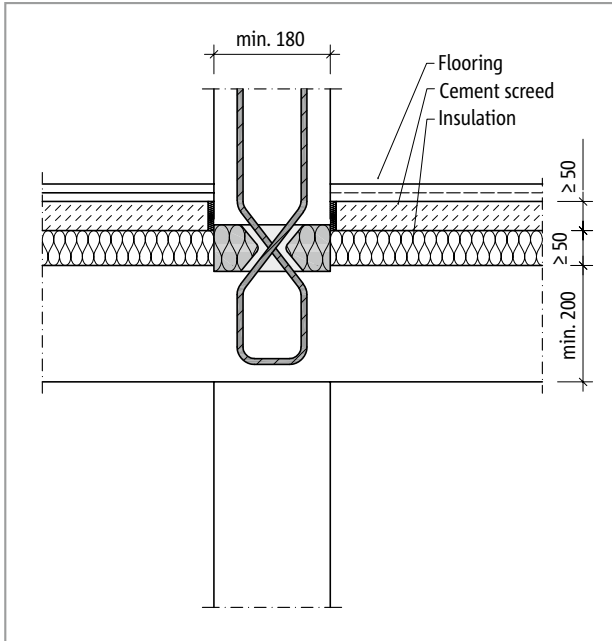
Schöck Sconnex® type W: R 120 / EI 30 with internal wall and above-slab insulation
